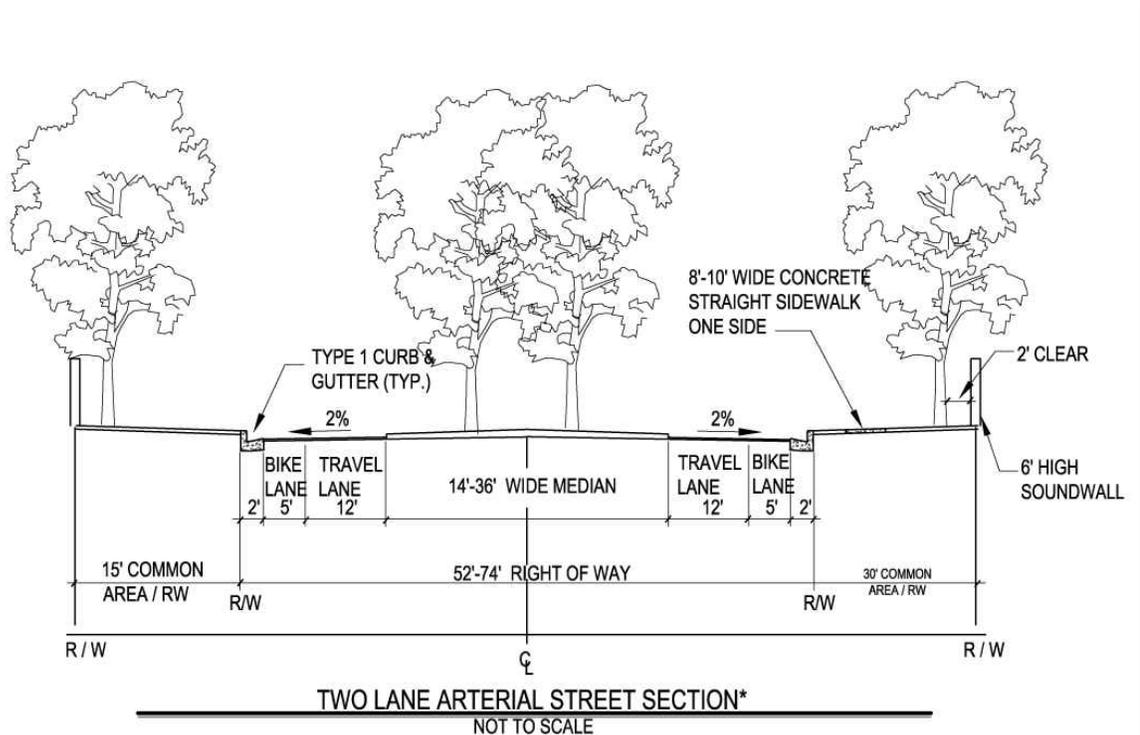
Typical Two Lane Arterial Street Cross Section (LID Alternative)
